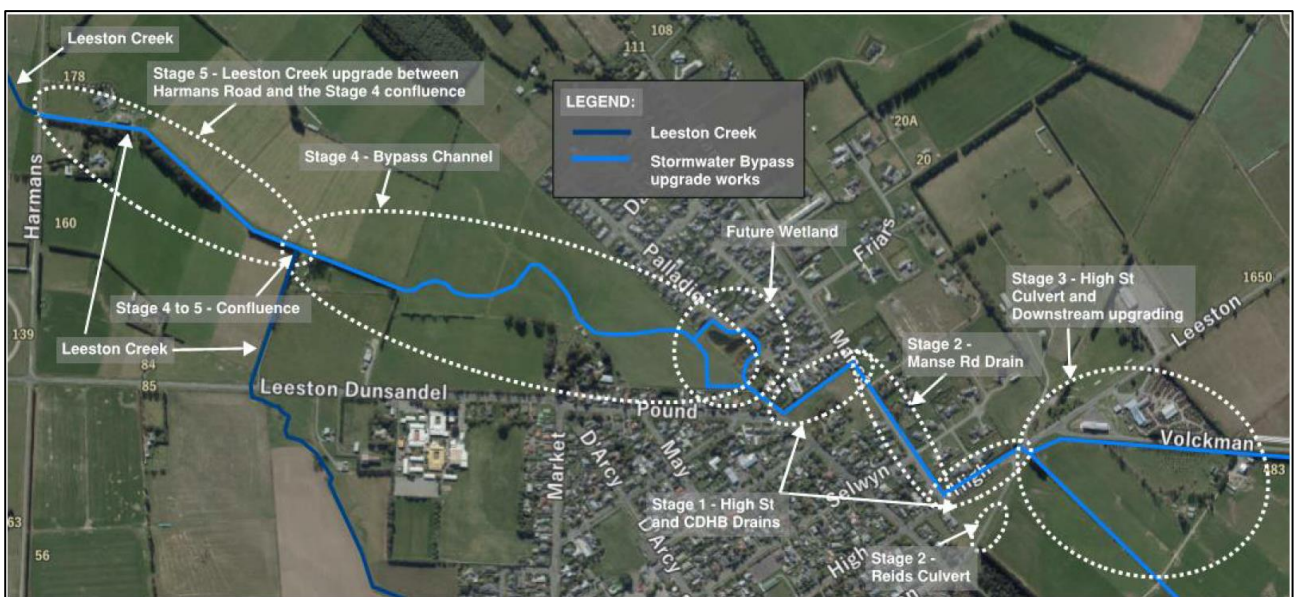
Design/construction stages for Leeston Stormwater Flood Bypass.
